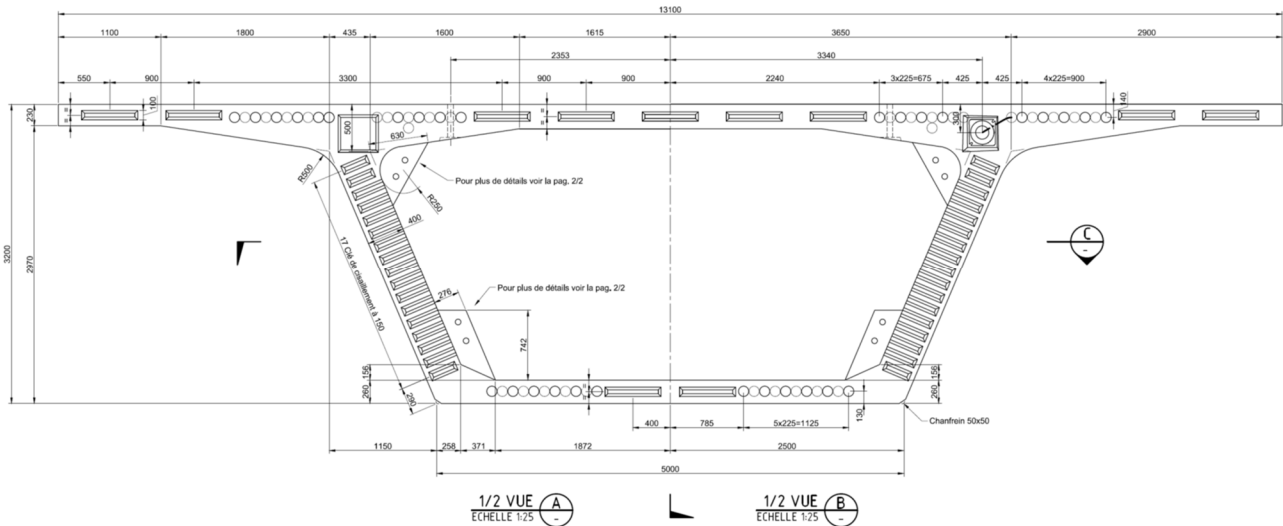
Cross section of Typical Segment / Sezione trasversale del concio tipico.
